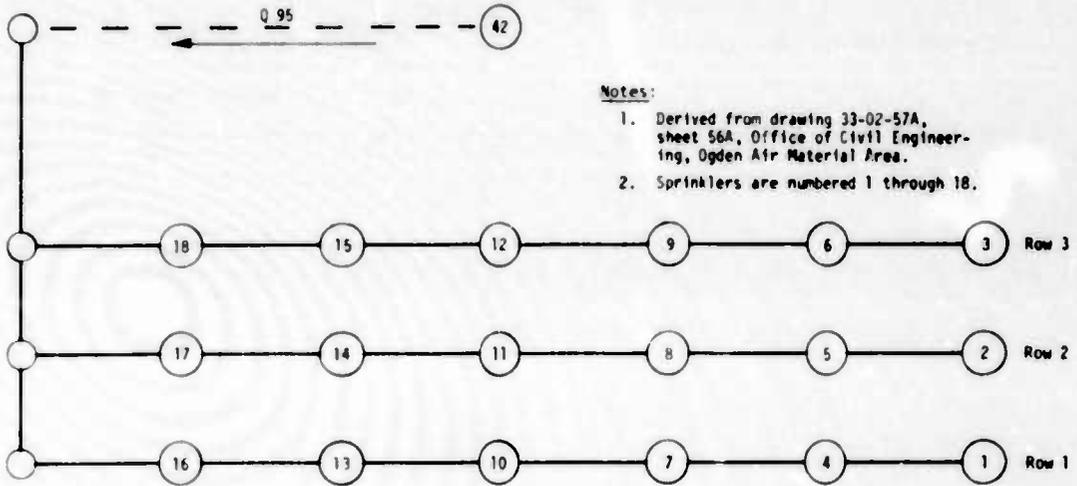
Sprinkler System in Building 850 at Hill Air Force Base
